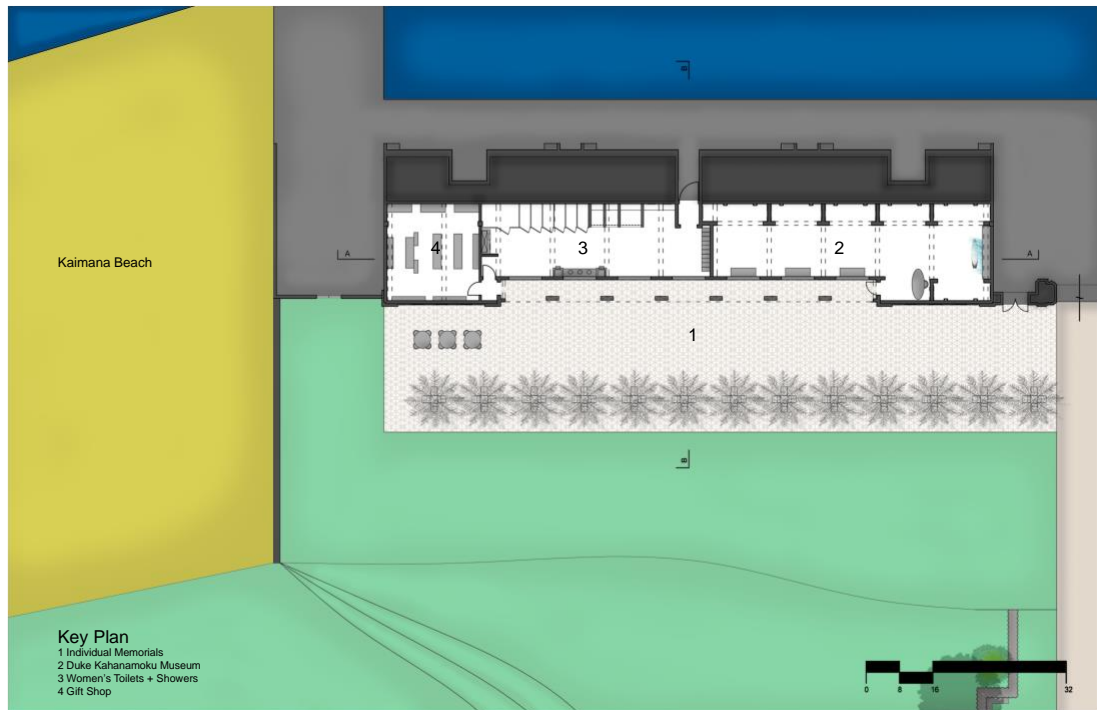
New Floor Plan of Memorial Natatorium: Diamond Head Side
